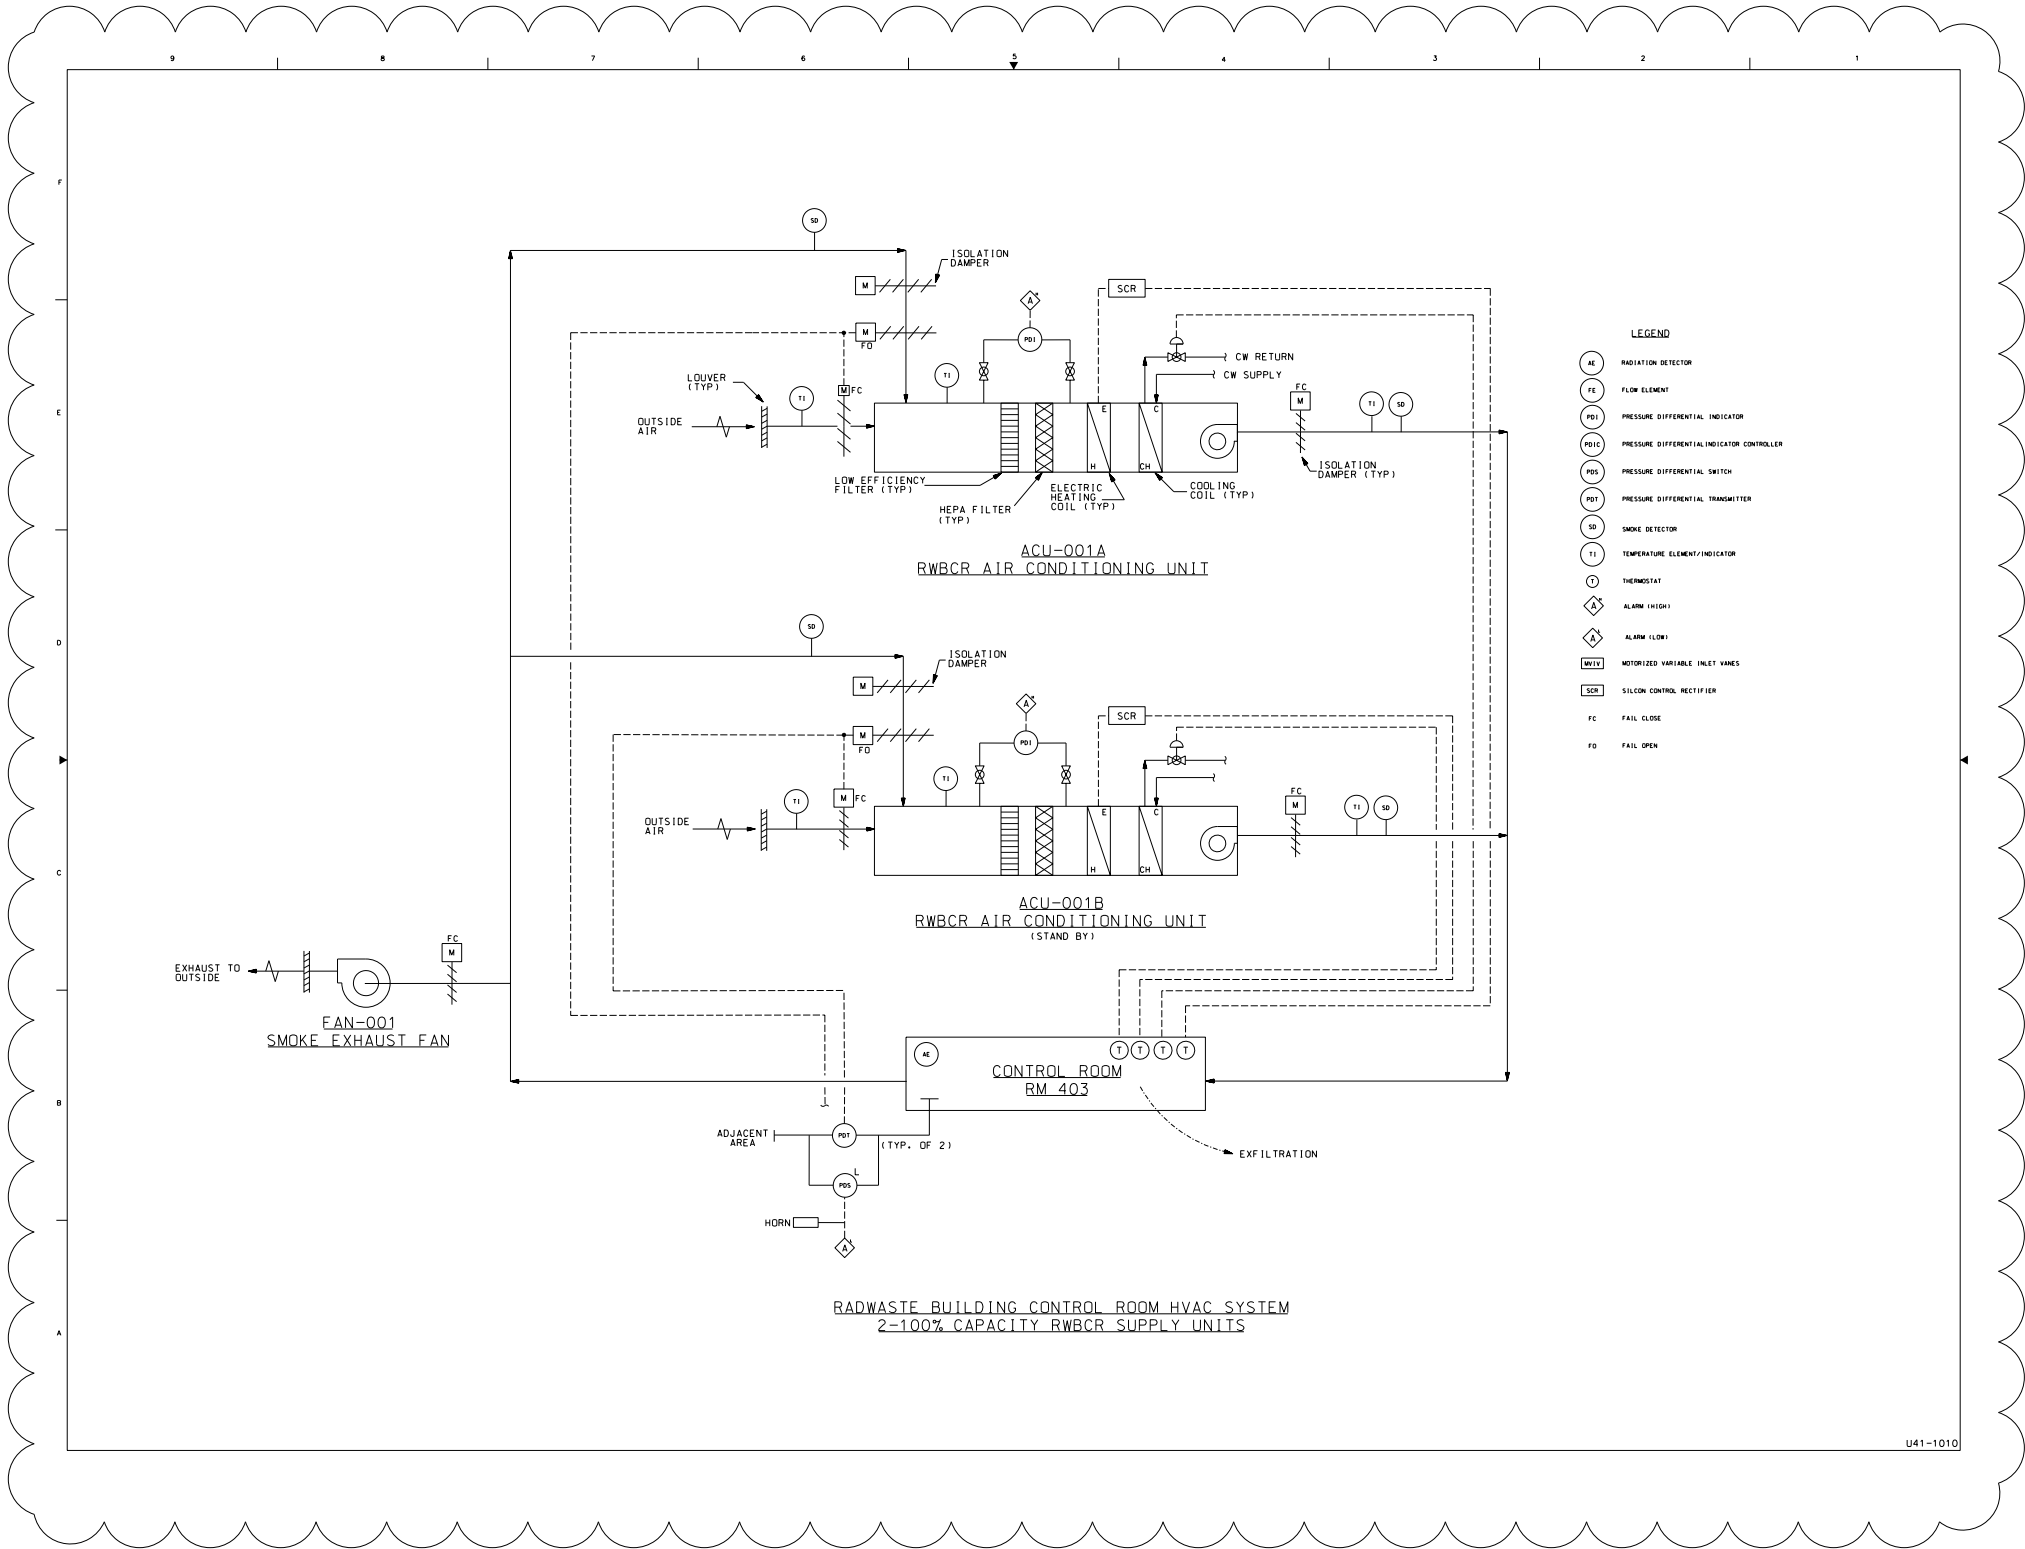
Radwaste Building HVAC P&ID (Sheet 1 of 3)
